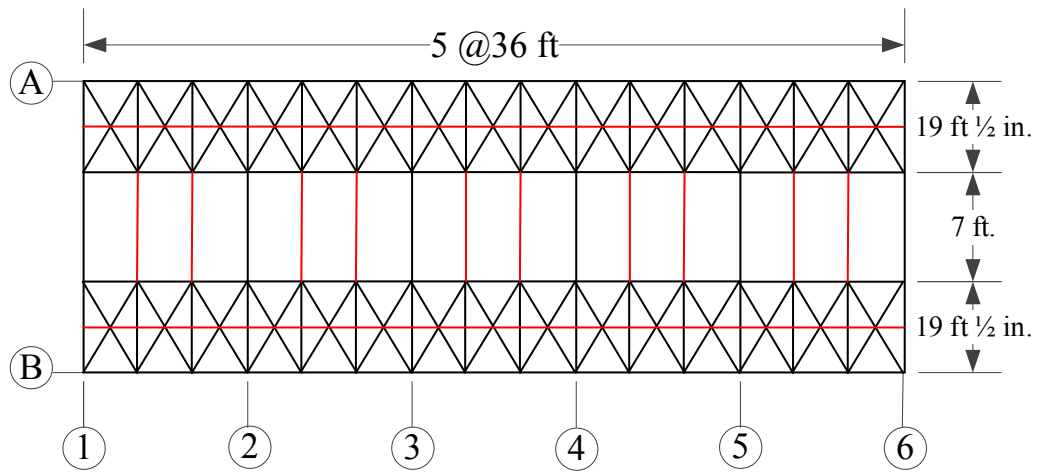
Modification on the layout of horizontal trusses(The additional members are shown in red color).
